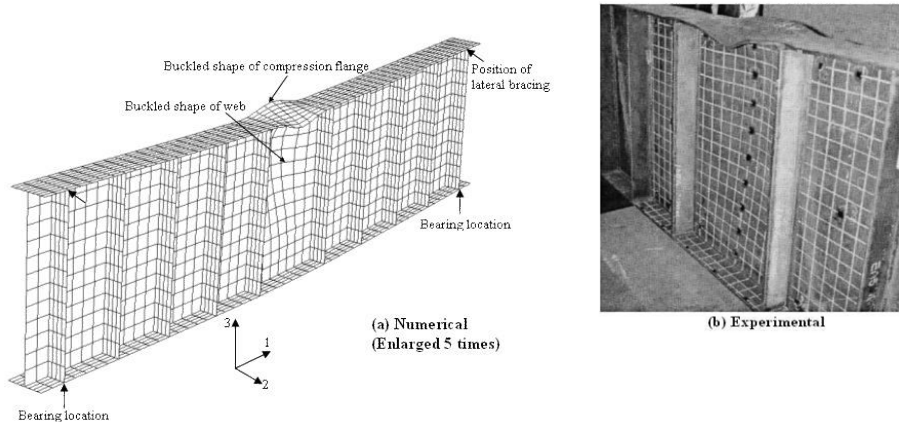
Comparison of failure modes of the plate girder bridge T1.
